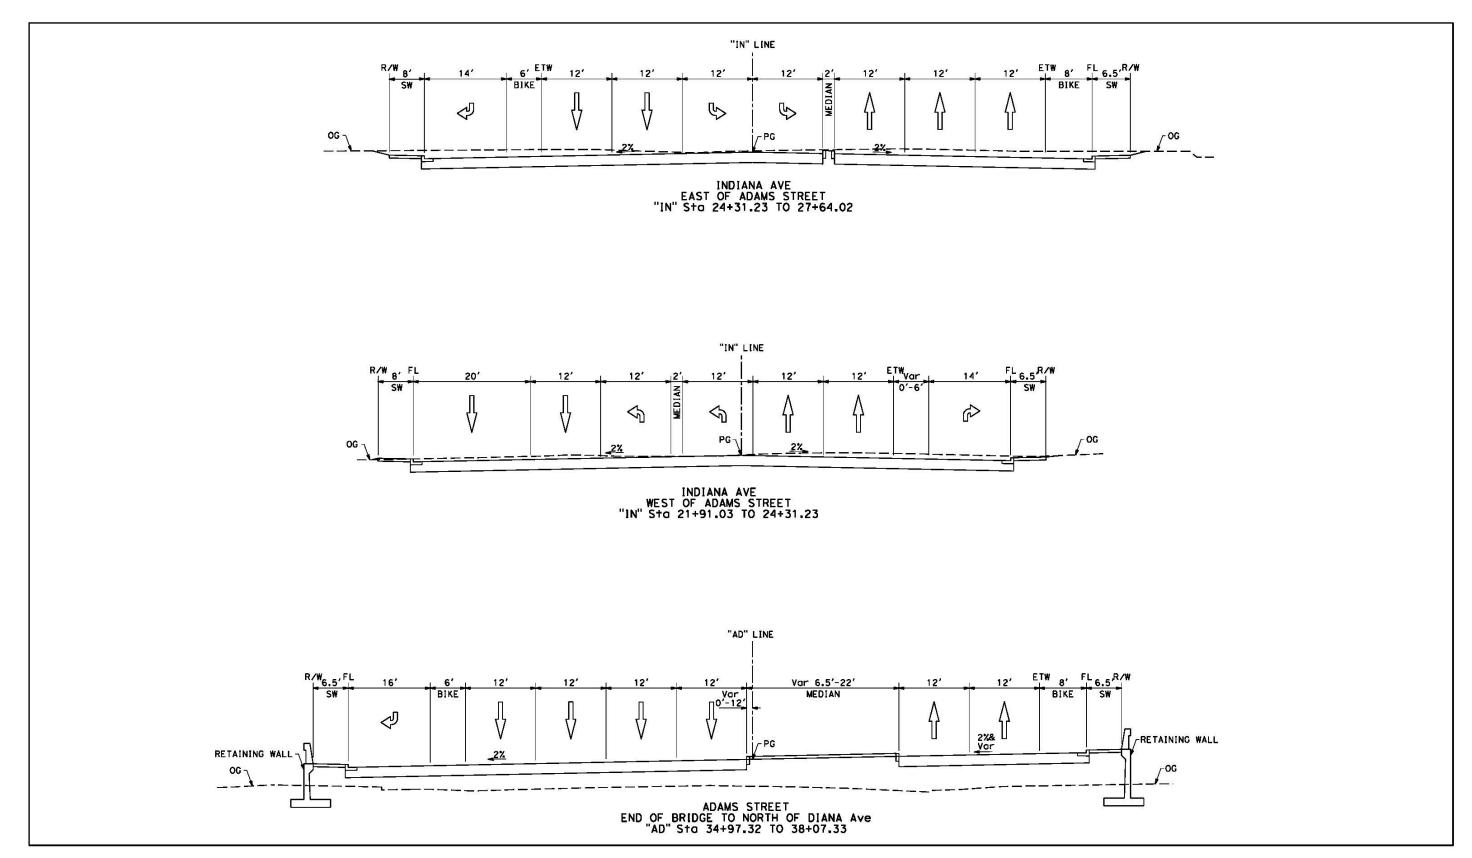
B. Typical Cross Section, Build Alternative 7 (Locally Preferred Alternative)
